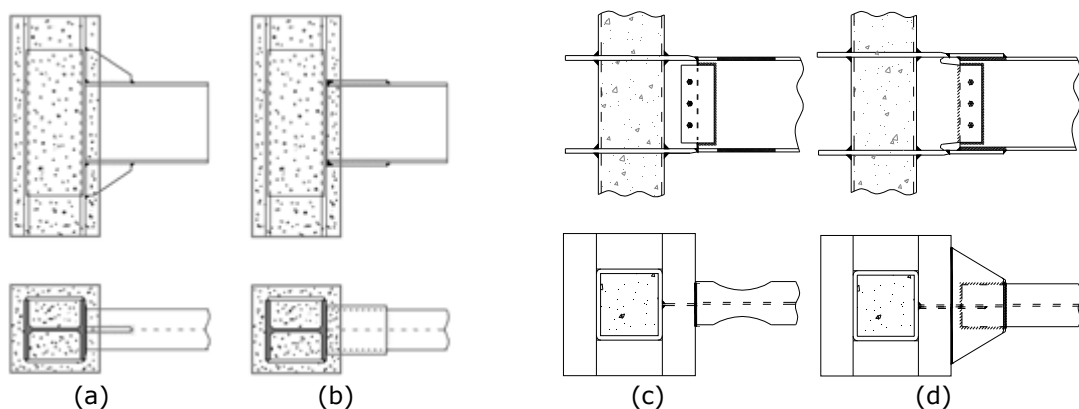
Welded beam-to-column joint configurations: (a) rib stiffener and (b) cover plate joints with FE-WF columns, (c) reduced beam section and (d) cover plate joints with CF-RHS columns
